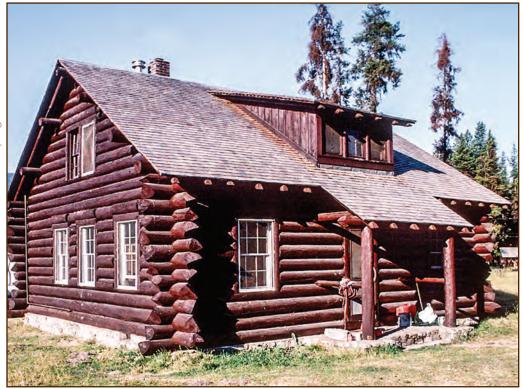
The shed roof dormer on the back of the Big Prairie Ranger Station (Flathead National Forest, Northern Region) has flashing at the base, sides, and top. The roofers installed base flashing where the lower side of the dormer meets the roof. The board and batten siding on the sides of the dormer covers most of the step flashing. The roofers also installed flashing at the transition between the top of the dormer roof and the main roof (not visible in the photo).
